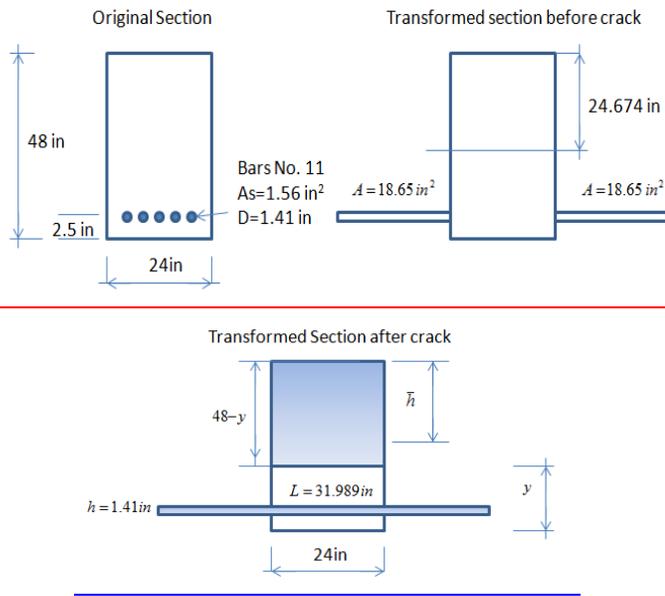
The girder section properties of the Smithers Bridge before and after crack appears.
